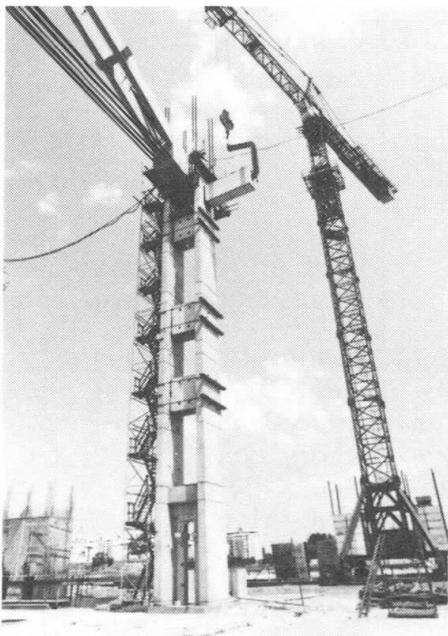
Pushing of the precast supporting beam through the openings on the top of the column
